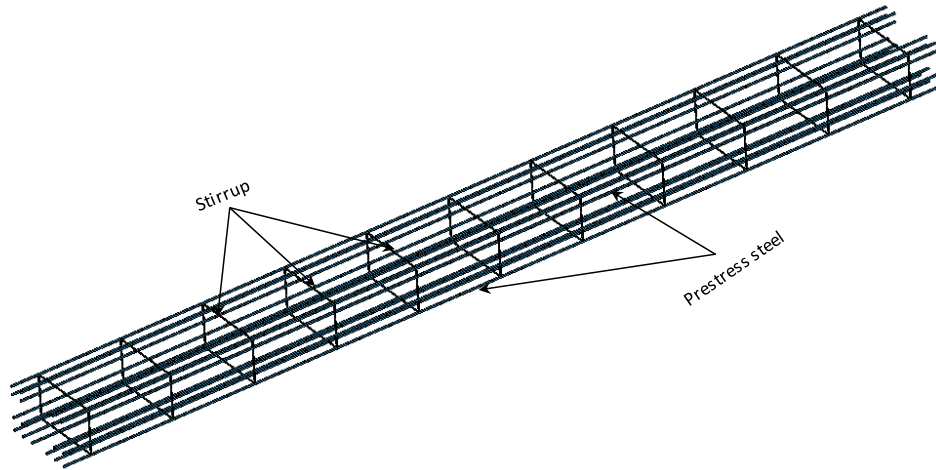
The finite element model of prestressed steels and the stirrups in concrete
